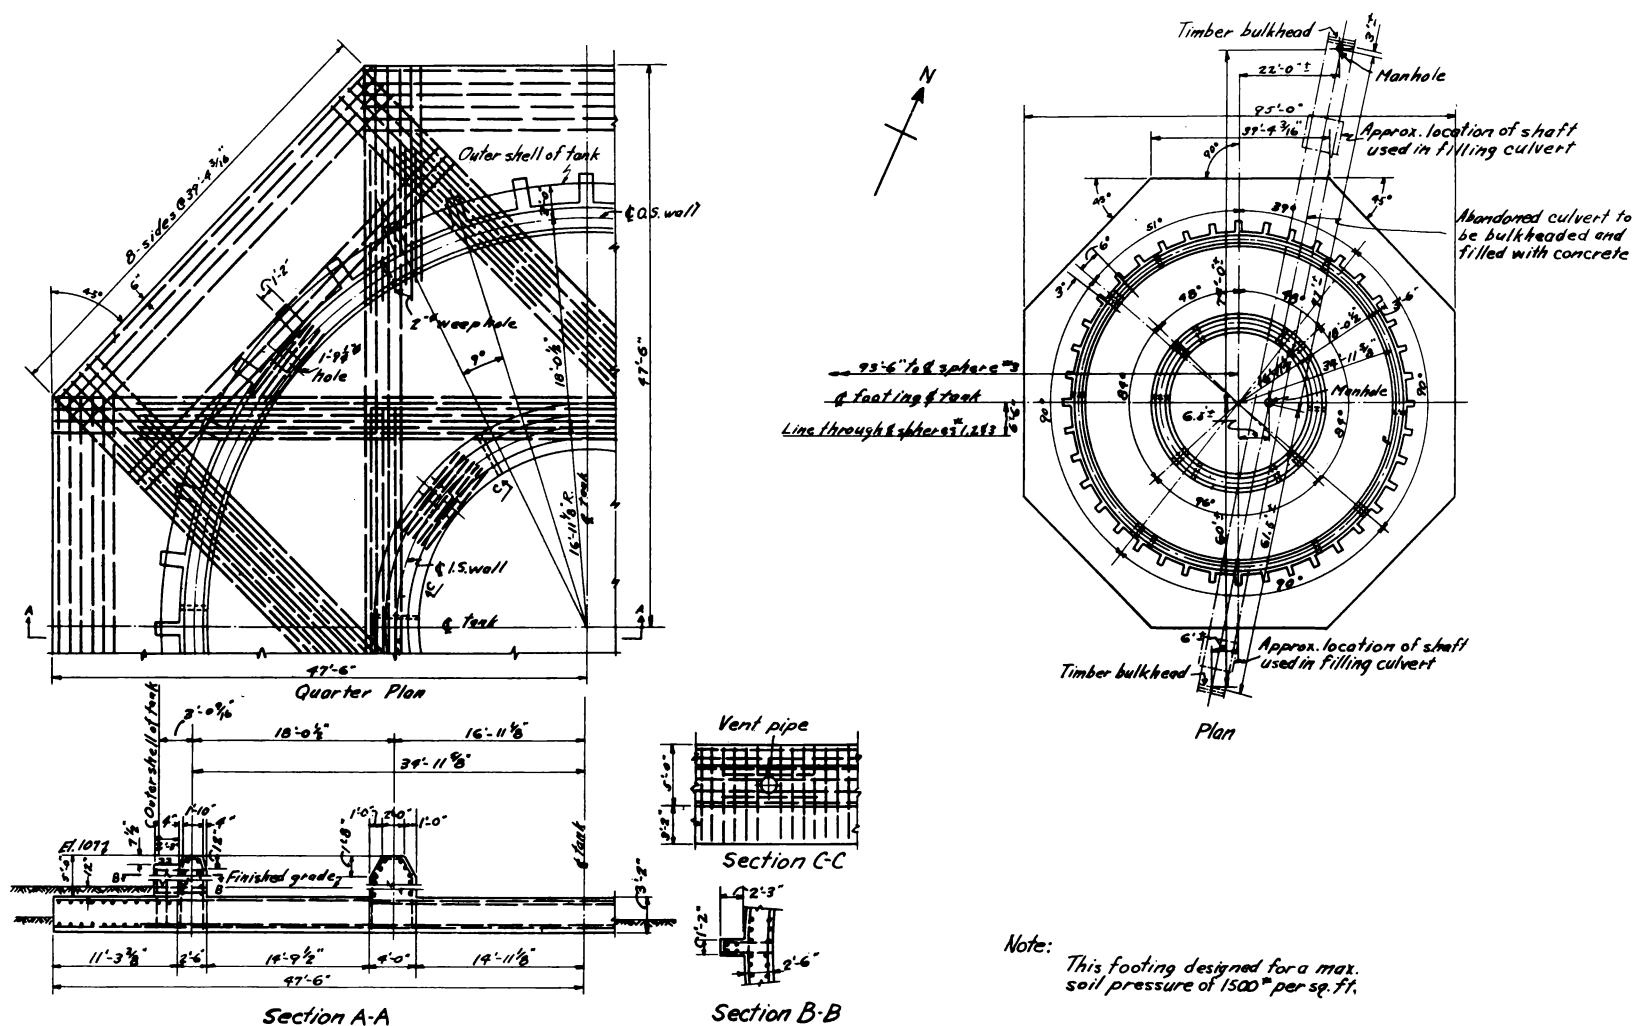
Reinforced-concrete foundation for liquefied-gas-storage tank No. 4.
